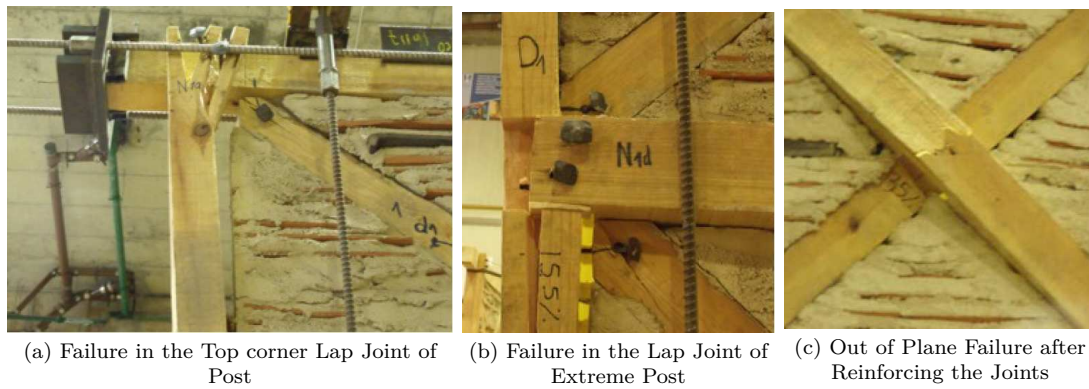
Modes of Failures for the Wall studied by Meireles et al. [102] before and after Reinforcing Joints
